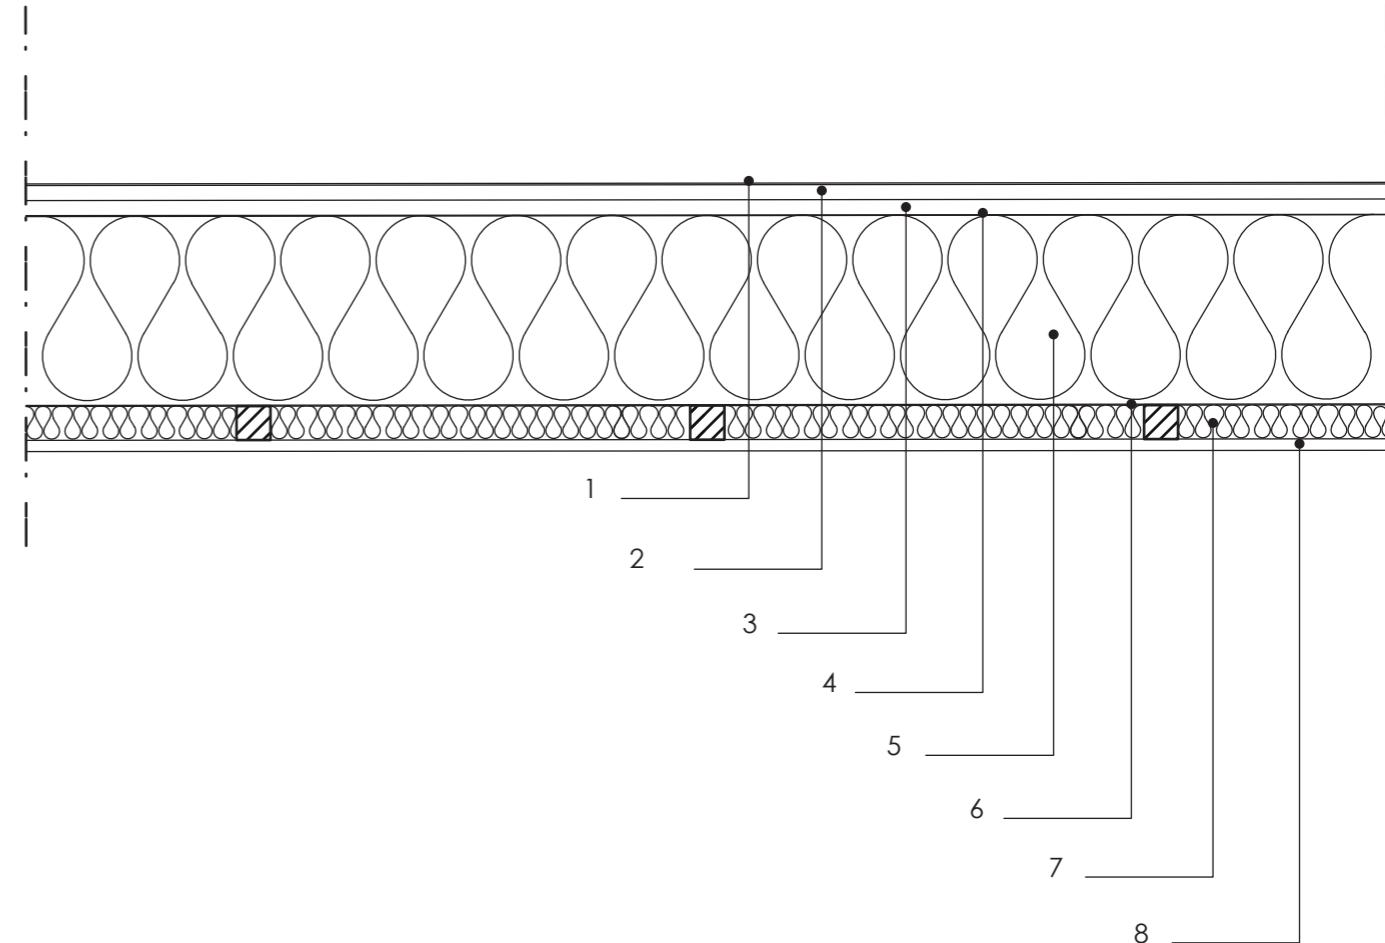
Roof detail, scale 1:10 [AutoCAD]
